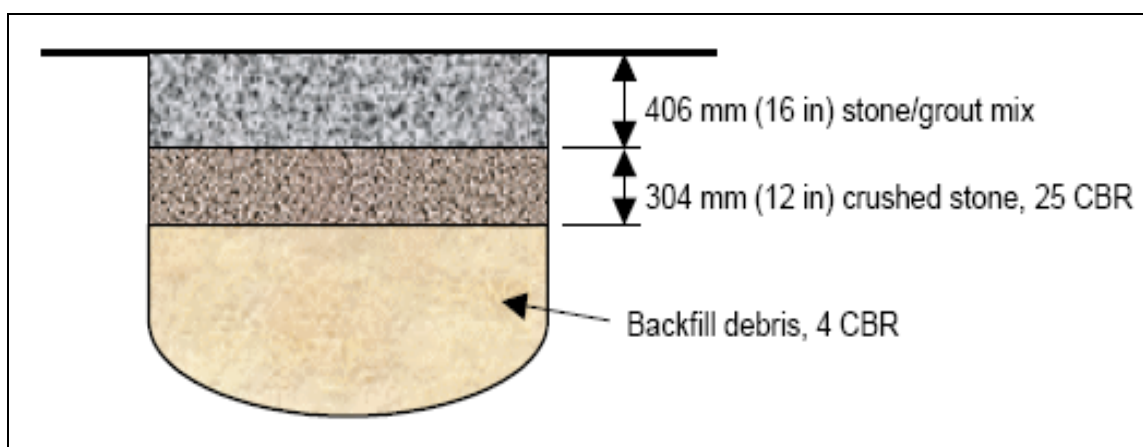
Cross section of stone and grout repair method from UFC 3-270-07
